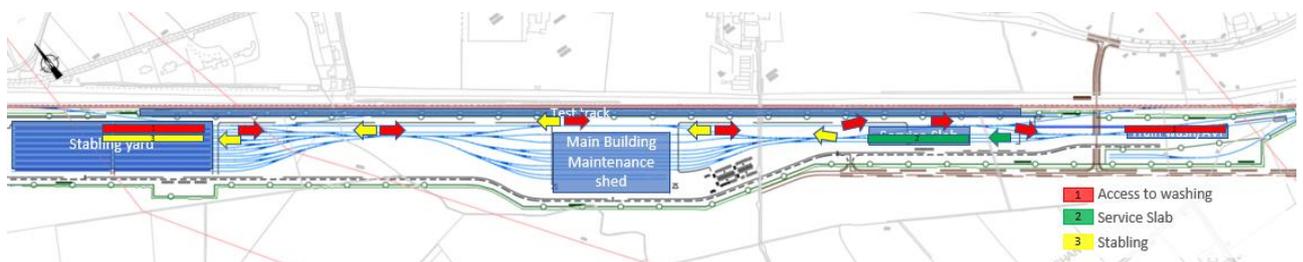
Movement 3: stabling → service/washing → stabling (Alternative 4)
